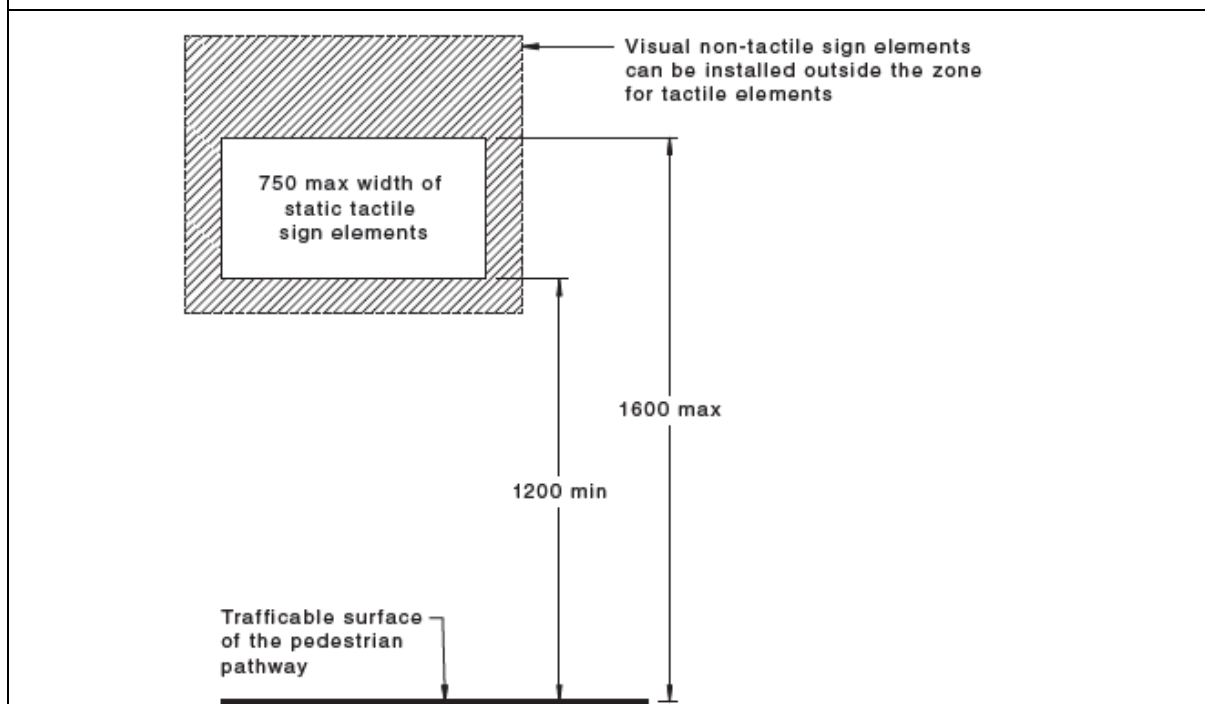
(B) — Installation requirements for static vertically mounted tactile and braille sign elements — Elevation
